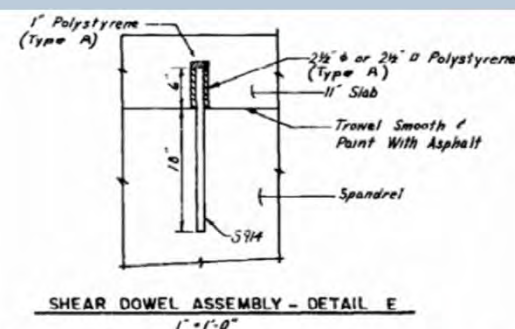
Detail of vertical dowels with foam surrounds, from 1980 plans.
